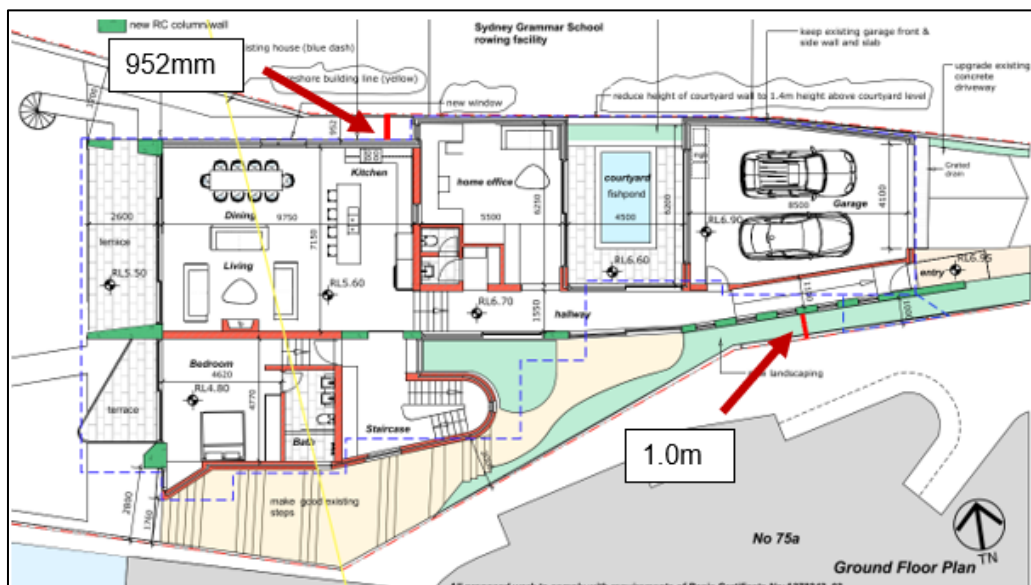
Side setbacks notated on ground floor plan (blue dotted line shows outline of existing house)
